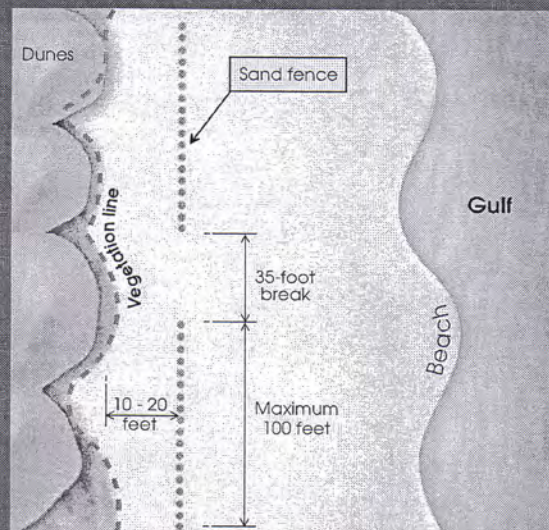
Placement of dune-building structures for repairing damaged foredues.
